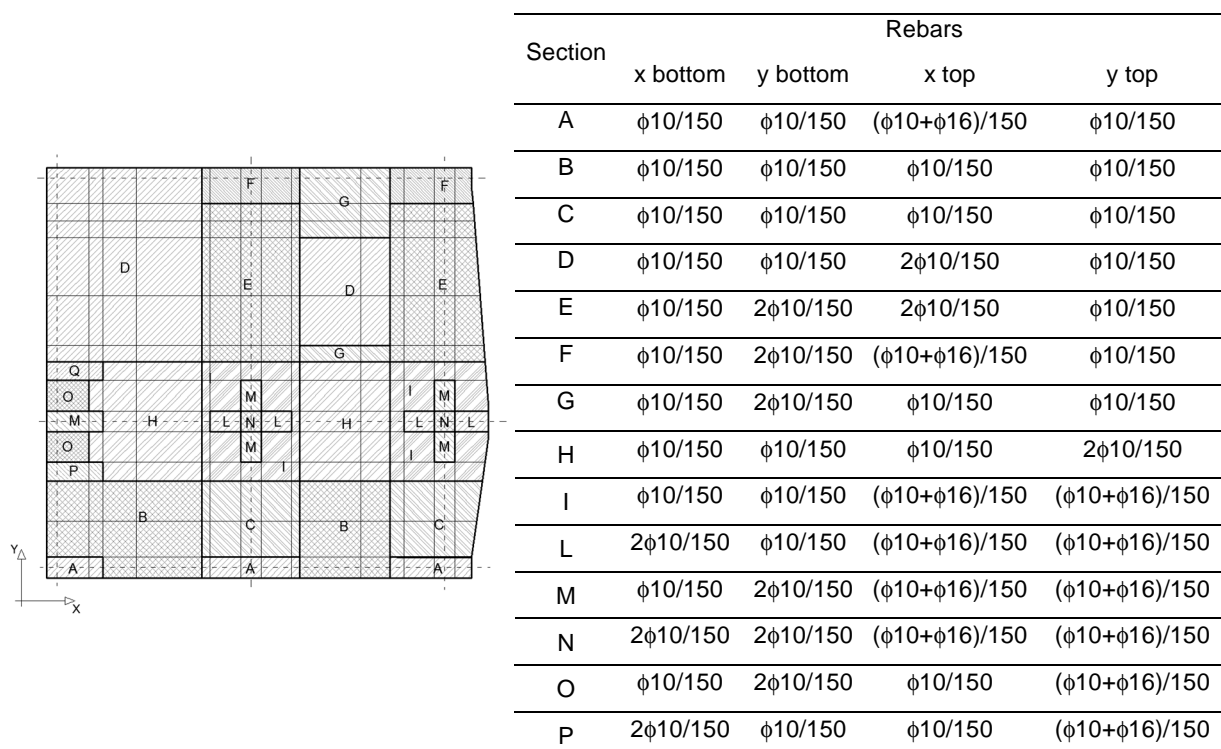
'Asymmetric' structure. (a) Concrete slab partitions; (b) slab section properties (measures in mm)
